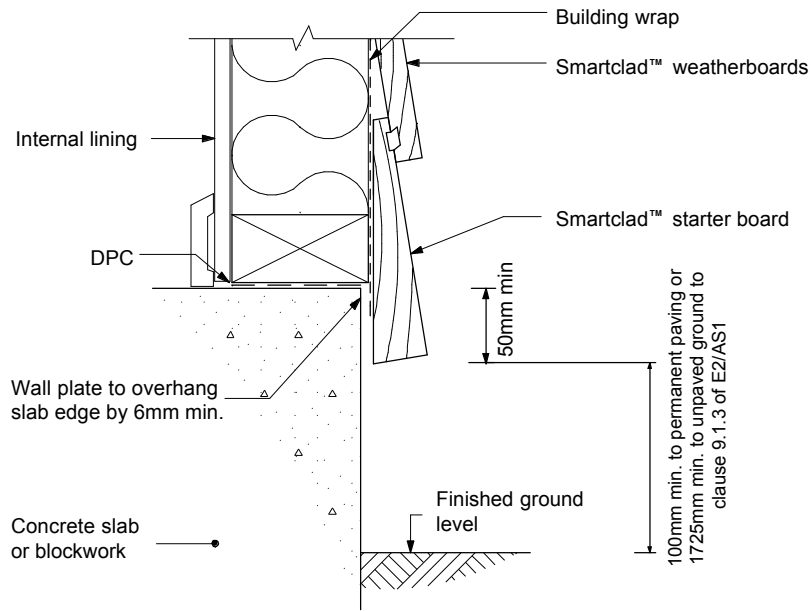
Direct fixed - Base of wall - Concrete floor
